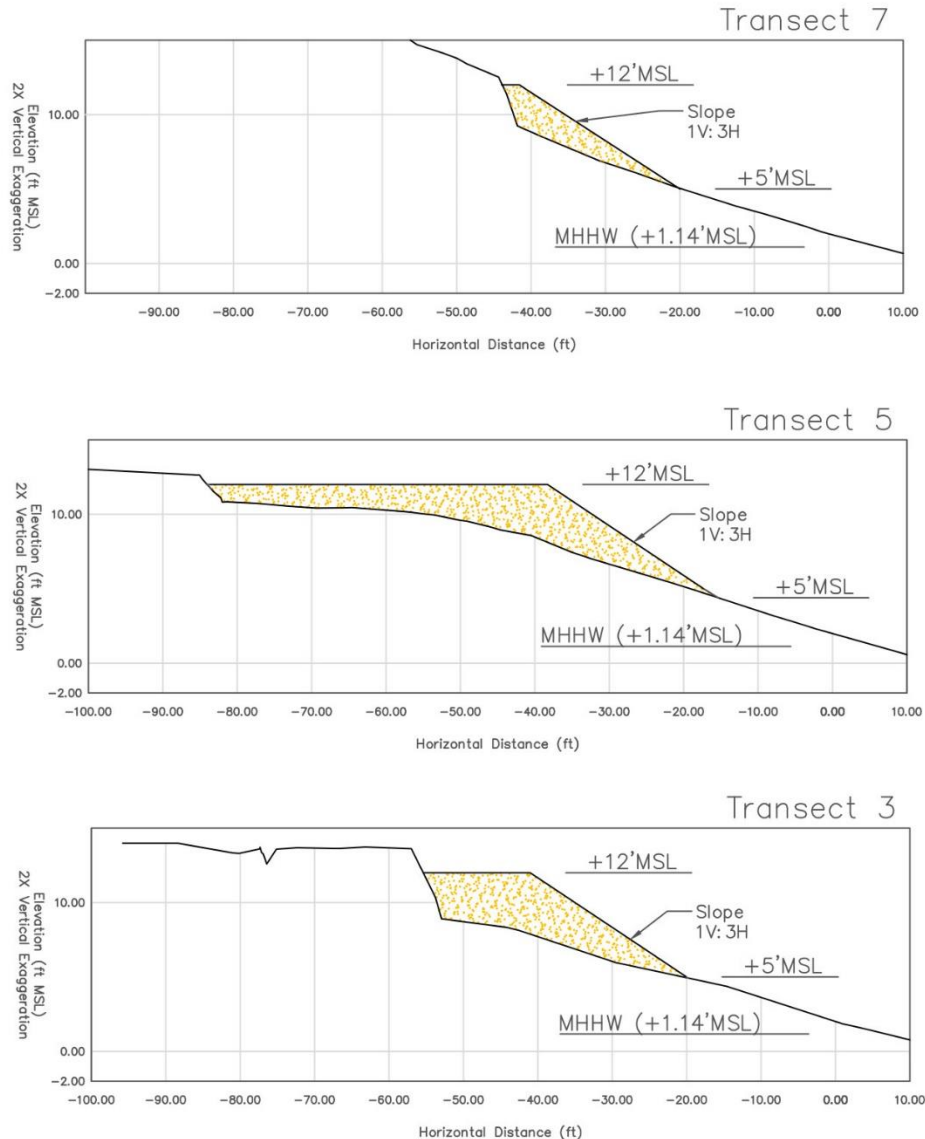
Typical berm maintenance profiles (LMSL Datum)
